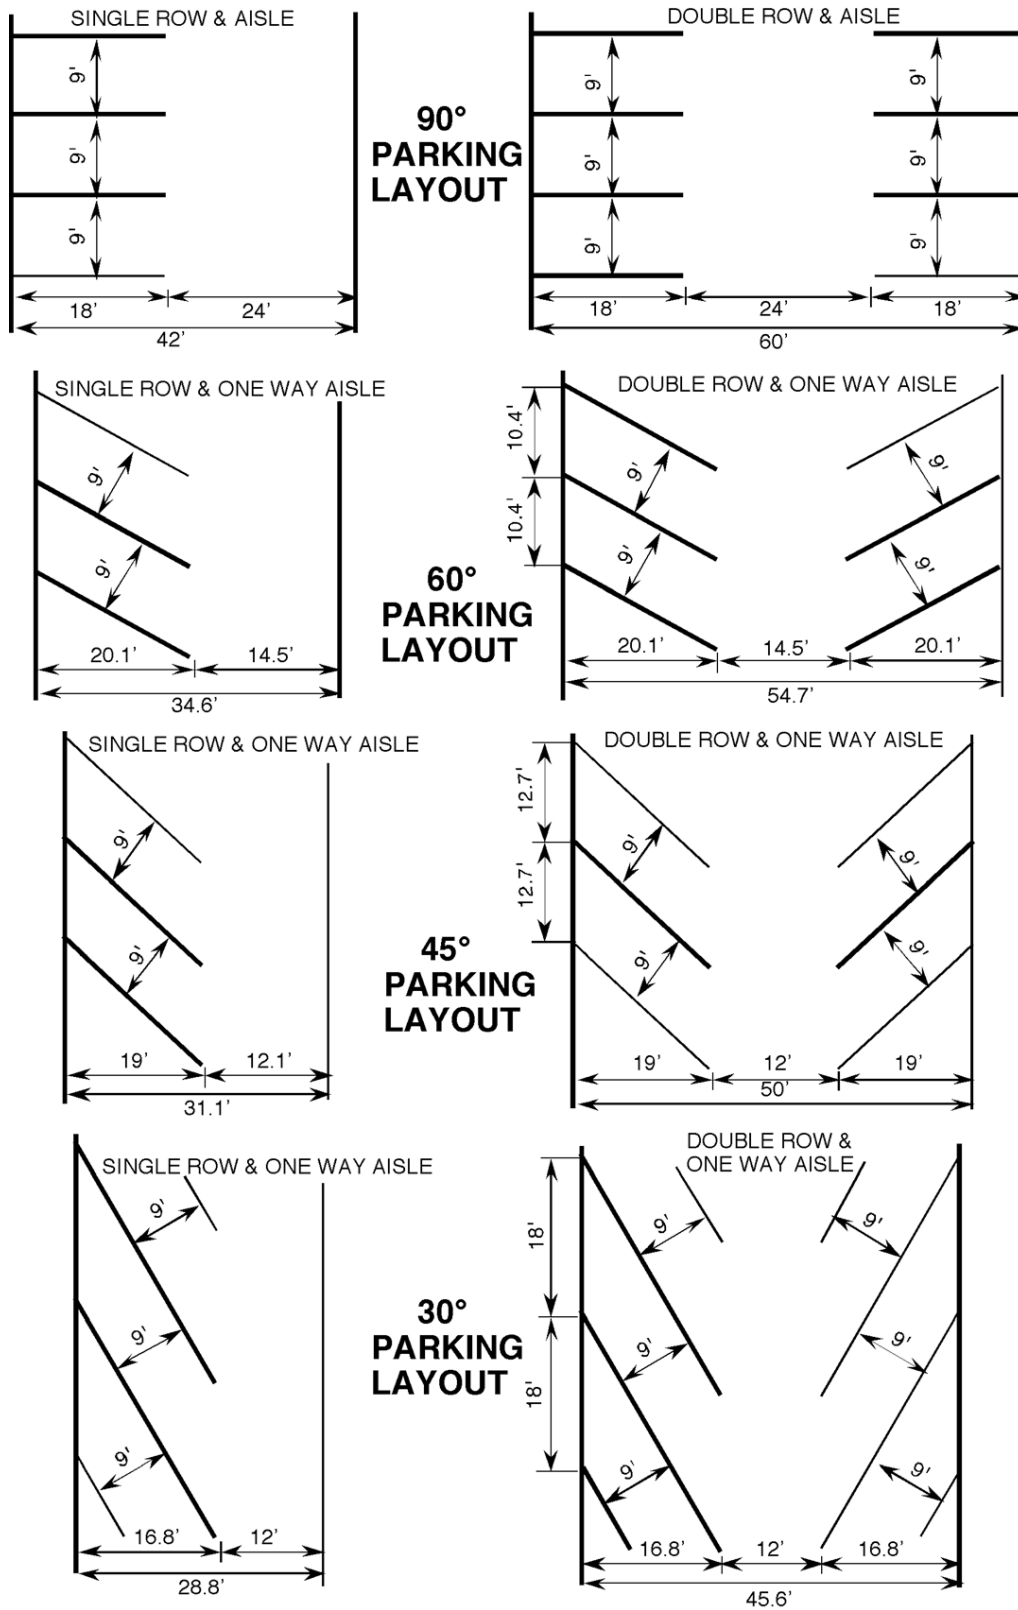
Typical Parking Lot Layouts and Dimensions
